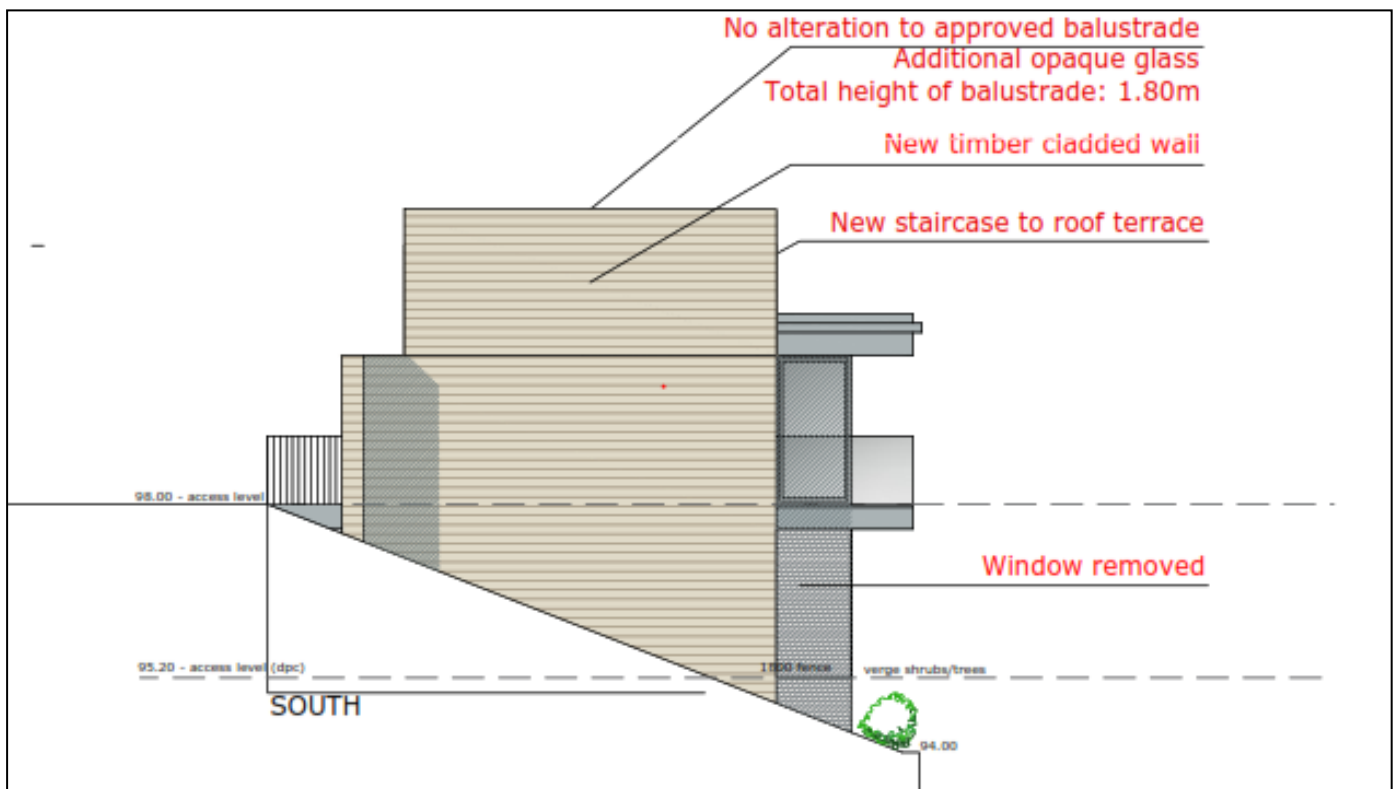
Proposed North Elevation (Drawing No: 1921 - 03C))
